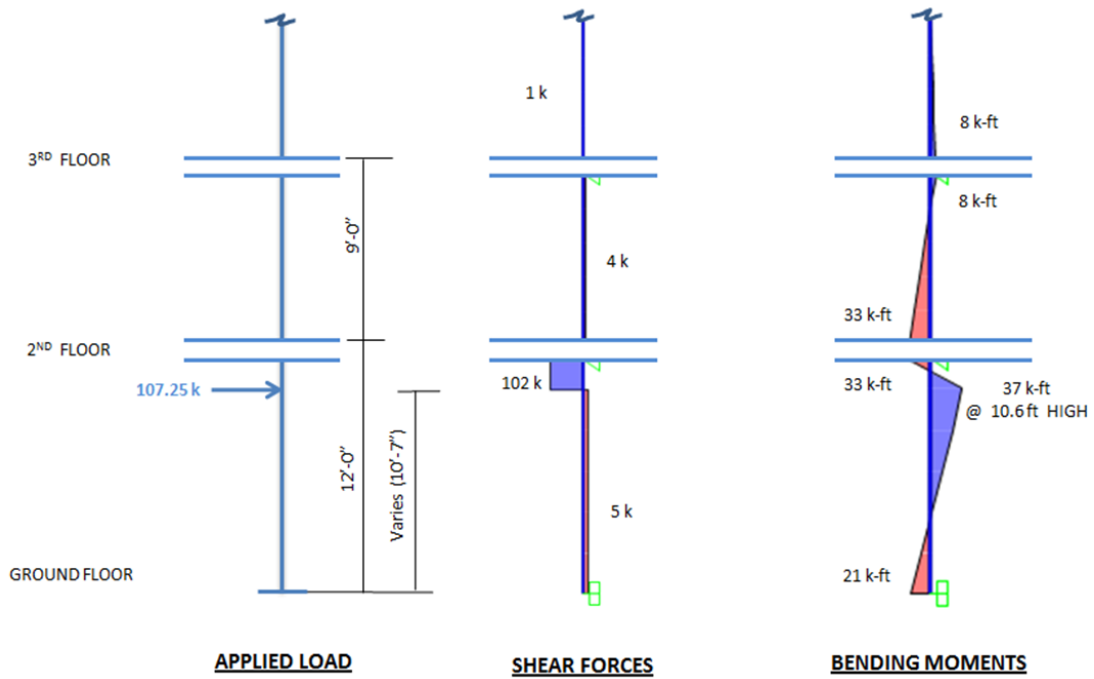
Impact load applied at d away from the end of column on the ground floor
